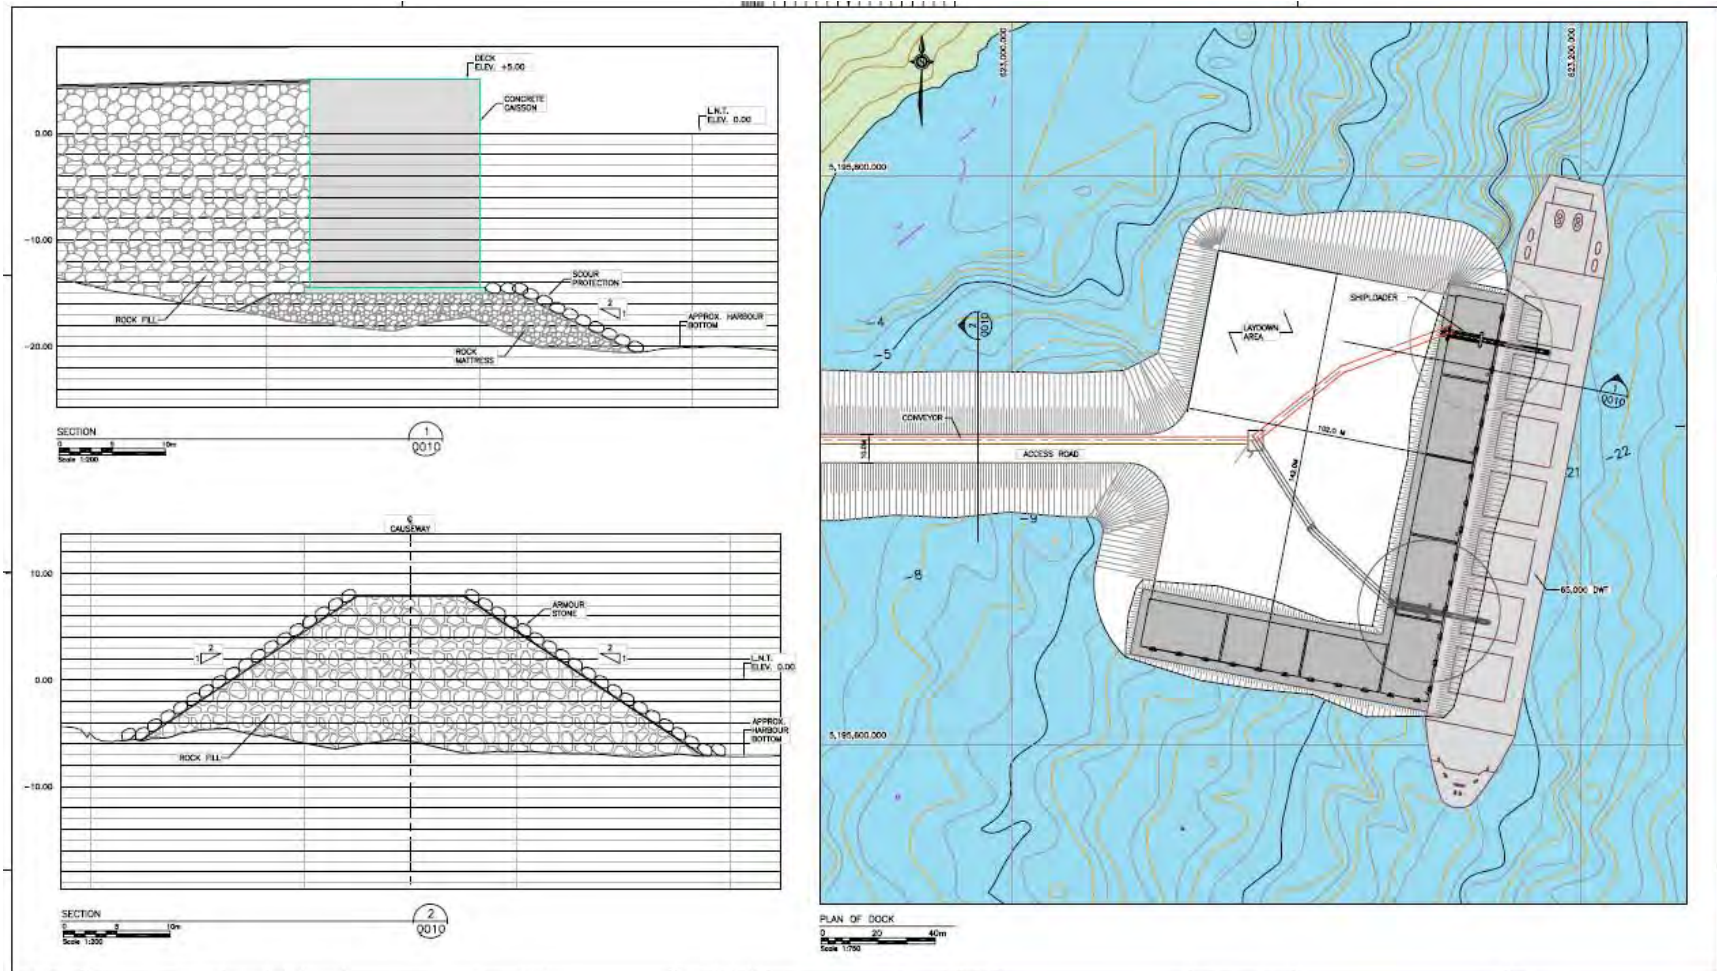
Marine Terminal Layout and Cross-Sections Details
